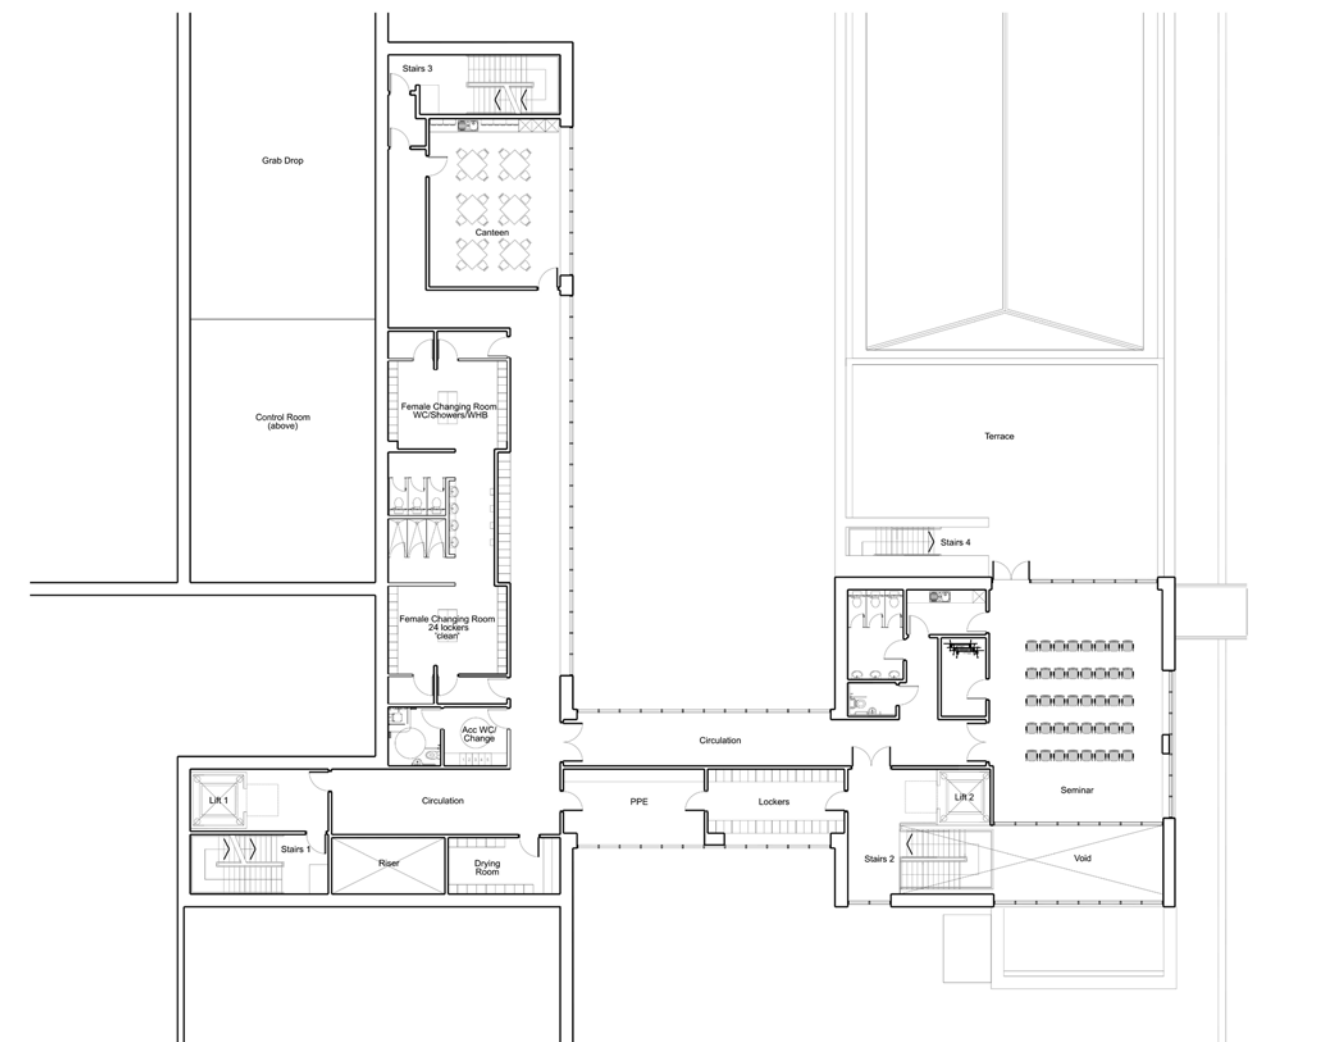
Proposed ERF level 4 floor plan – extract from drg PL114
